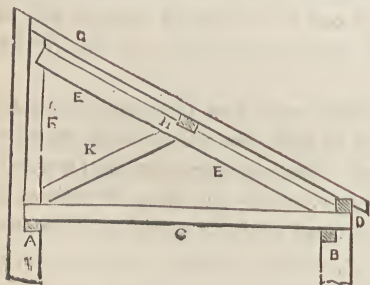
RAFTERS IN LEAN-TO ROOF.
